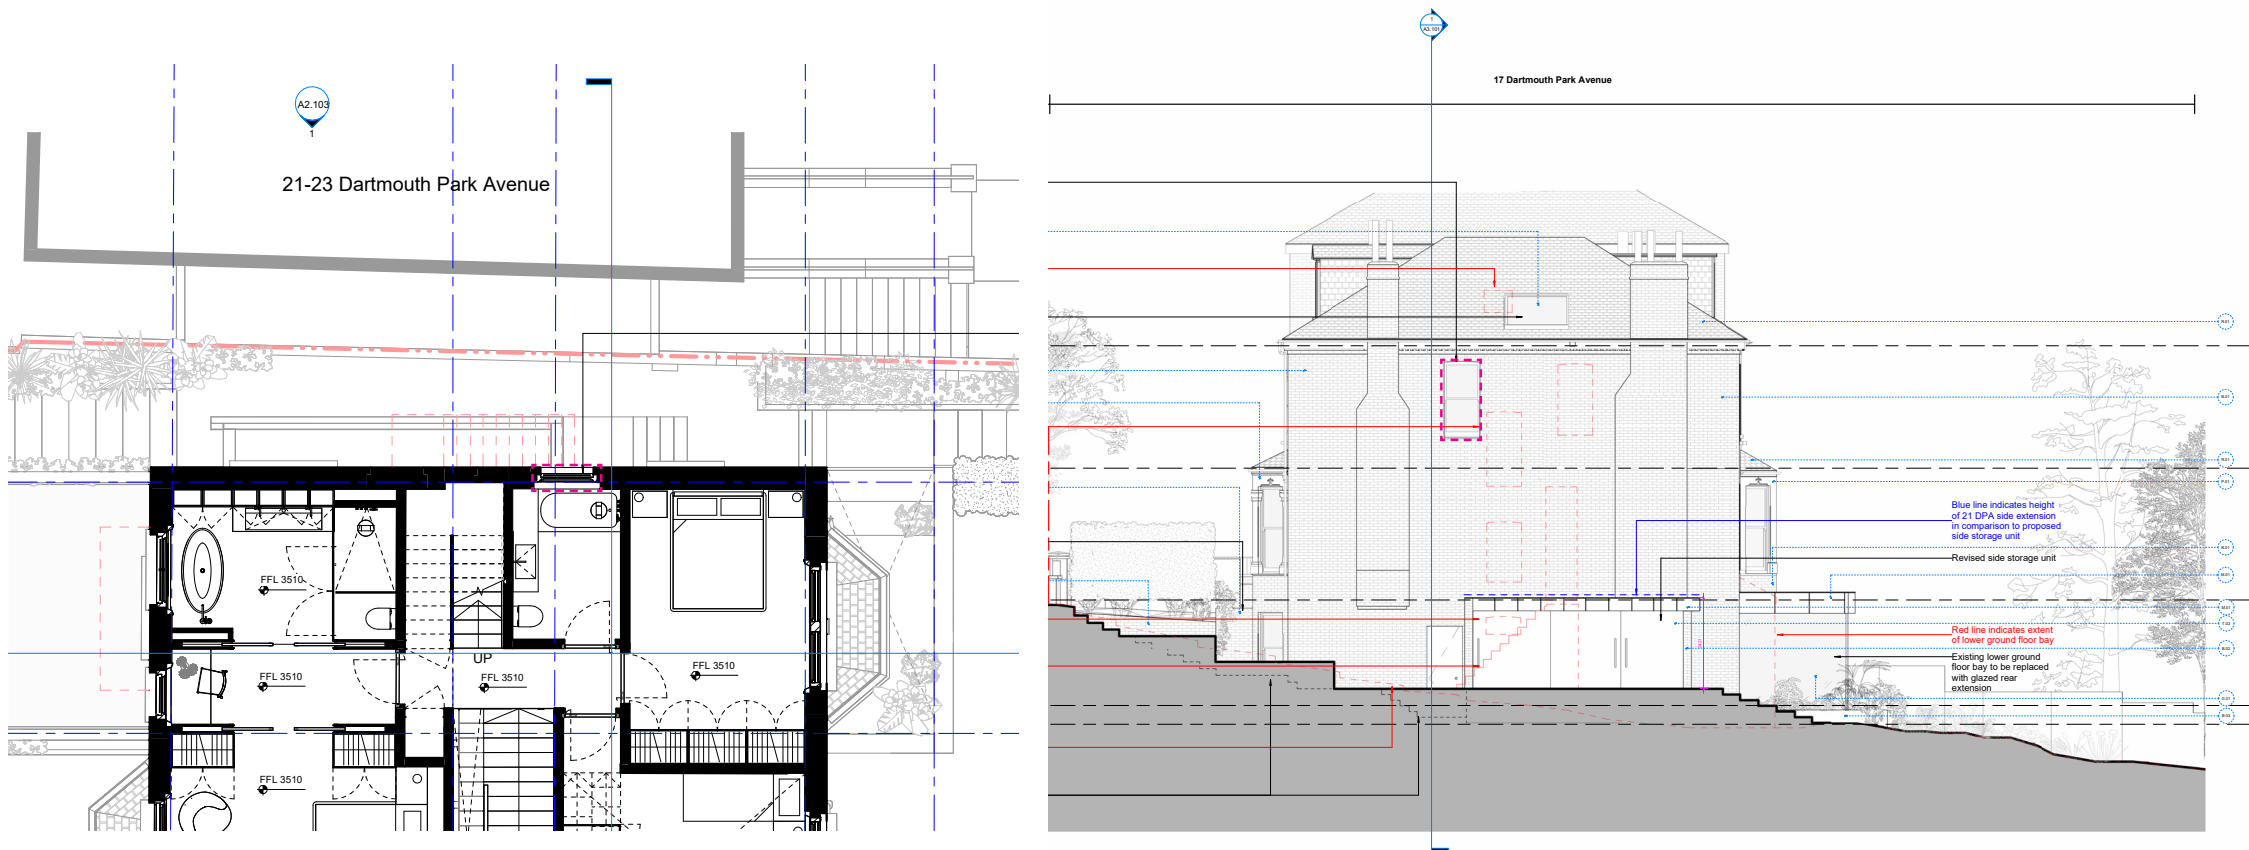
First Floor Plan and North Elevation with revised sash window location in Bathroom
